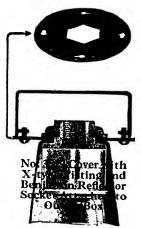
Fastening Reflector to Outlet Box Courtesy of Benjamin Electric Manufacturing Company
